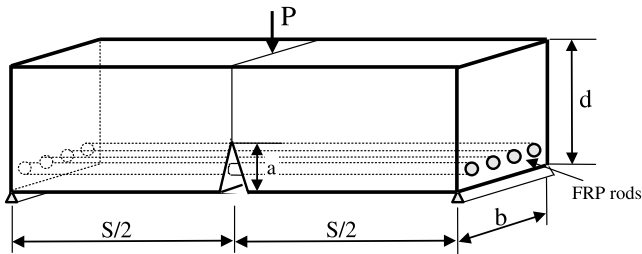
Three-point bending of a FRP reinforced concrete beam with a rectangular cross-section.
